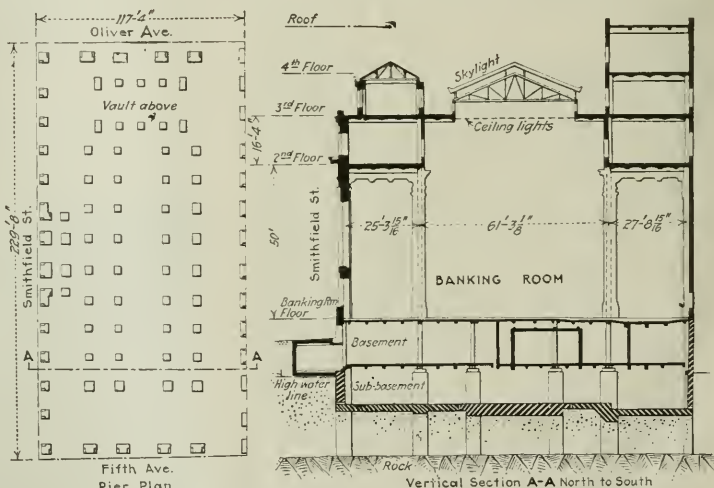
NORTH-SOUTH SECTION AND PIER PLAN OF MELLON BANK
